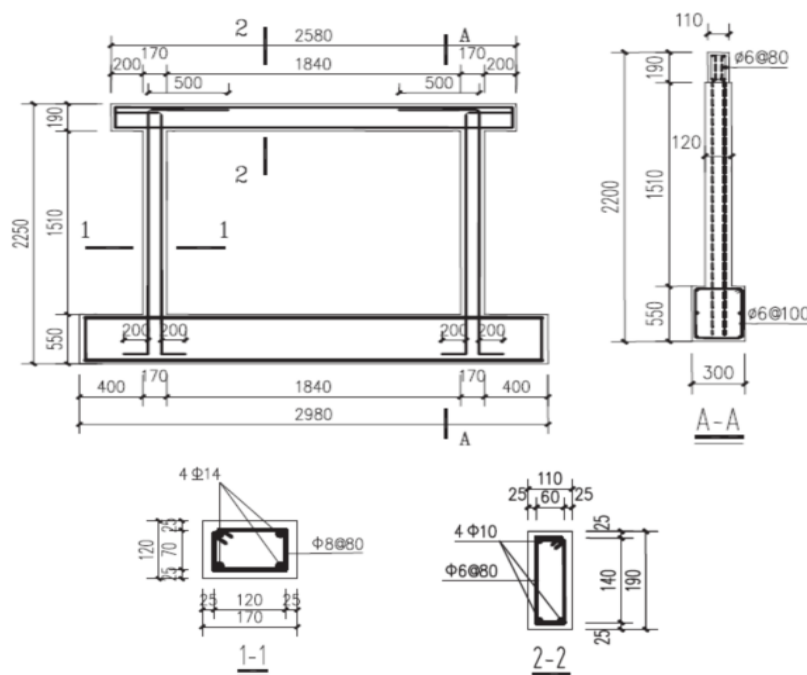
Dimensions and reinforcement details of the control specimen[6]
